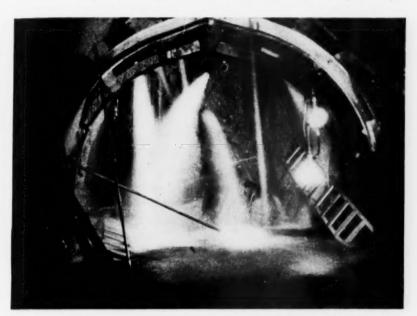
Tunnel Station, showing approximately 1,500 g.p.m. of water, highly charged with CO₂, coming from test and pilot holes in face
